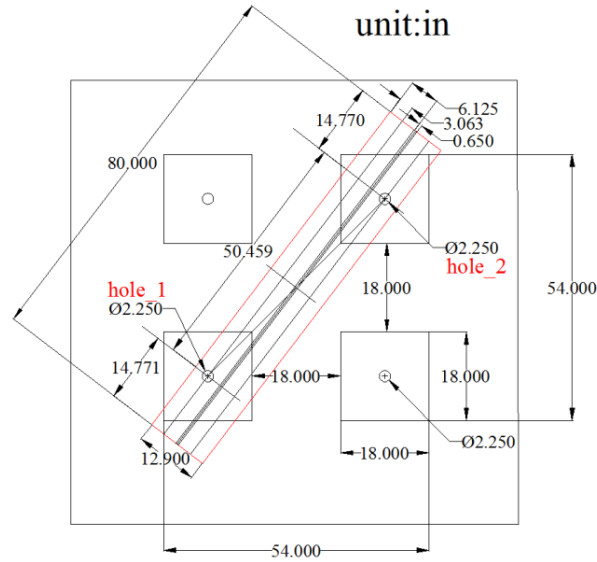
Connection of Steel Wide Flange Section to Strong Floor
